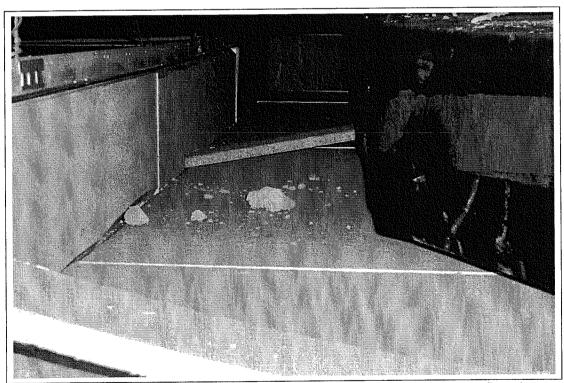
B floor west mechanical rm – large chunks of delaminated fireproofing above ceiling
